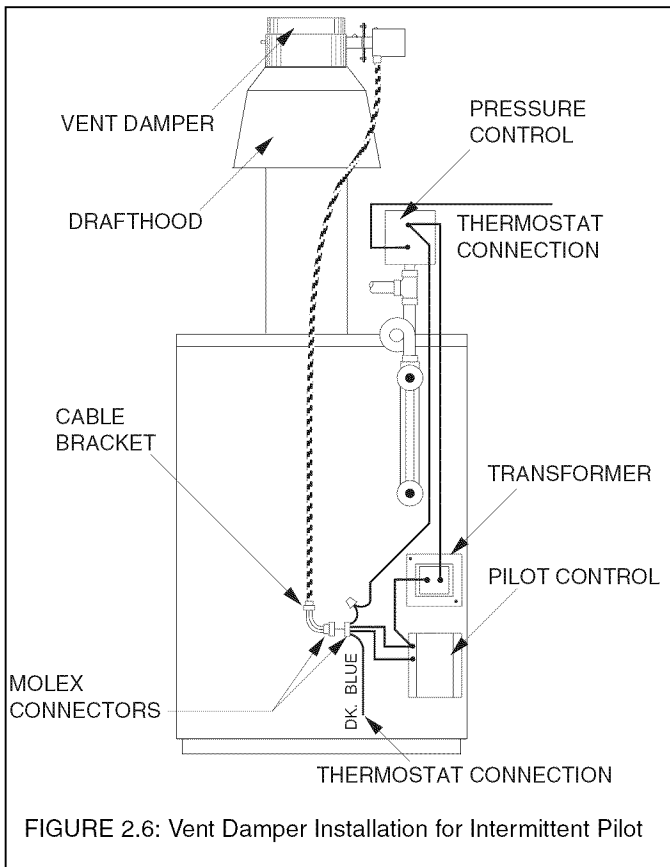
Vent Damper Installation for Intermittent Pilot
